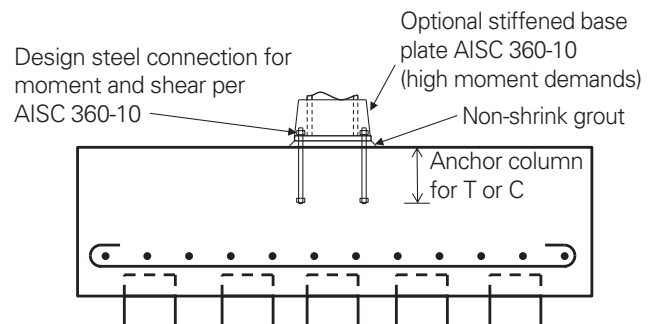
Typical steel column-to-pile cap connection detail (high moment demand).
